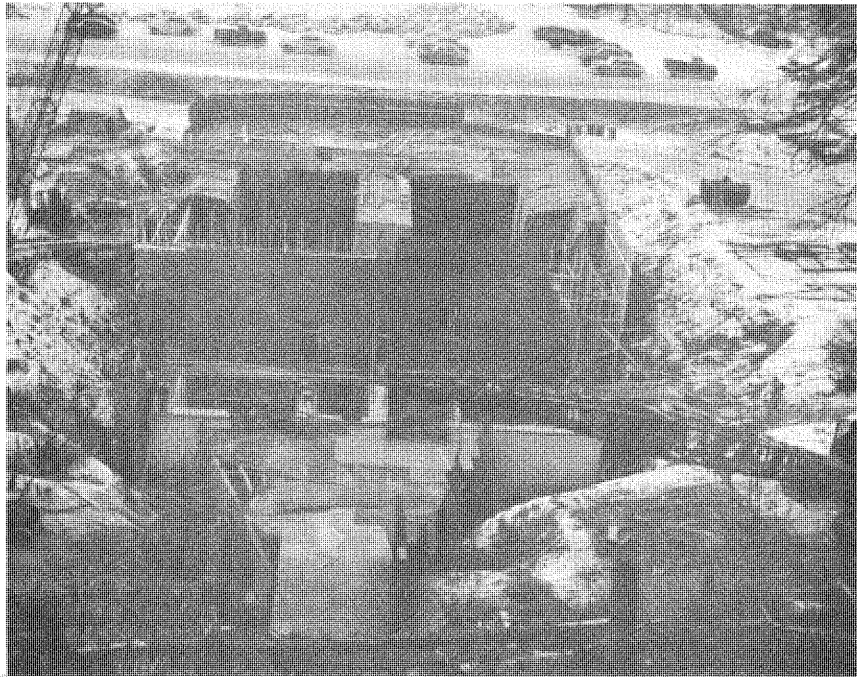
View of powerhouse during erection of protective walls. P783-908-1512, November 23, 1953.
